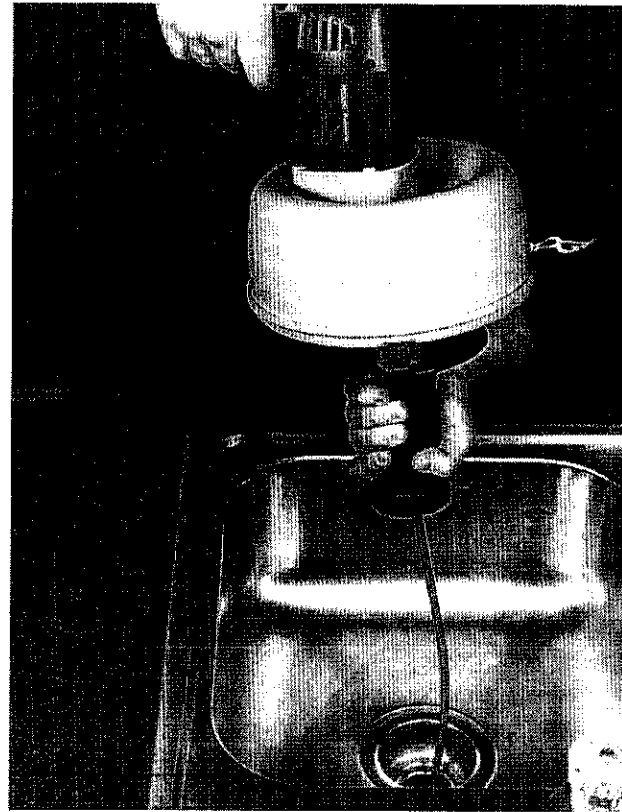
Pull handgrip forward to disengage clutch and draw additional cable from canister.
